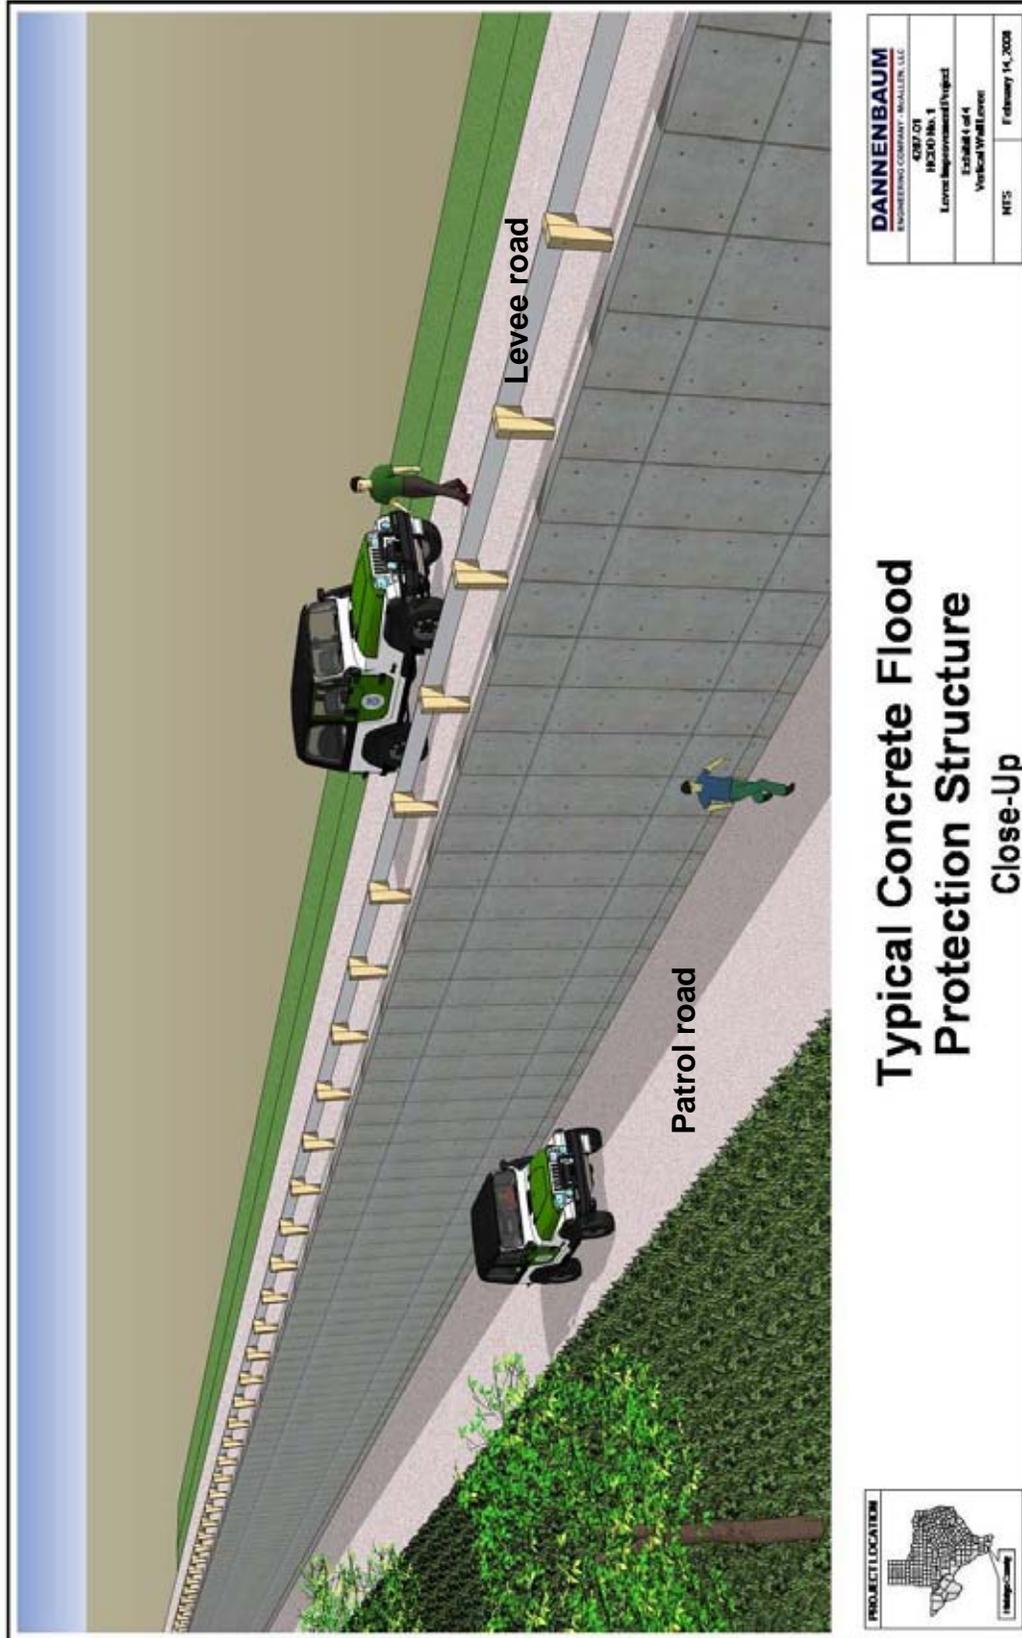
Conceptual Drawing of Concrete Flood Protection Structure/Concrete Fence
